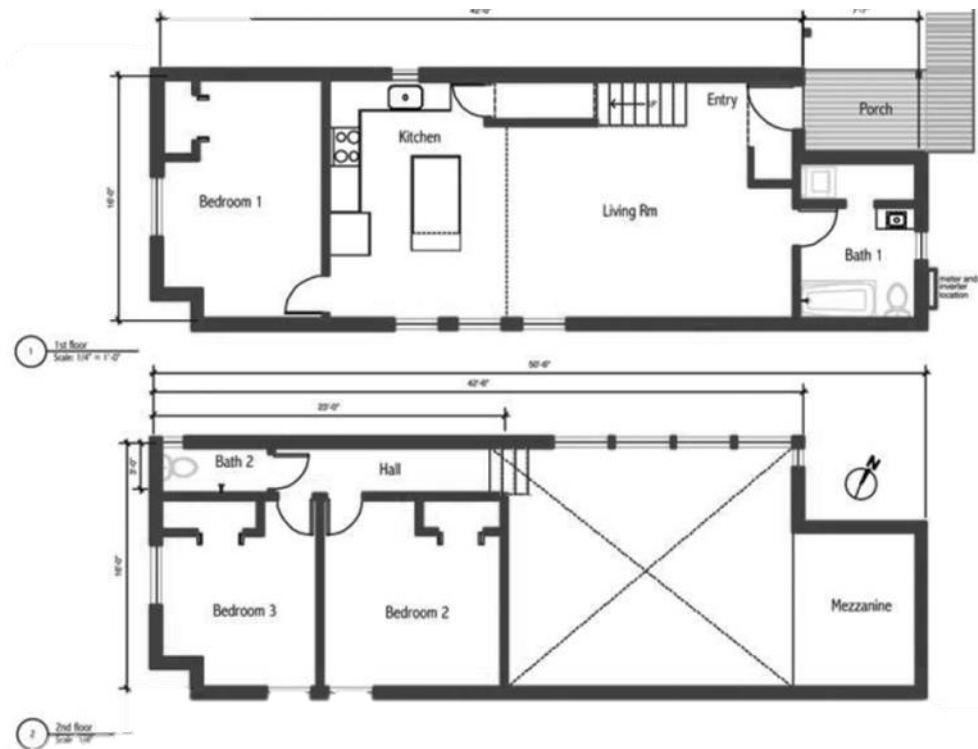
Le-Bois house ground and first floor layout (Saft and Helton, 2012)
